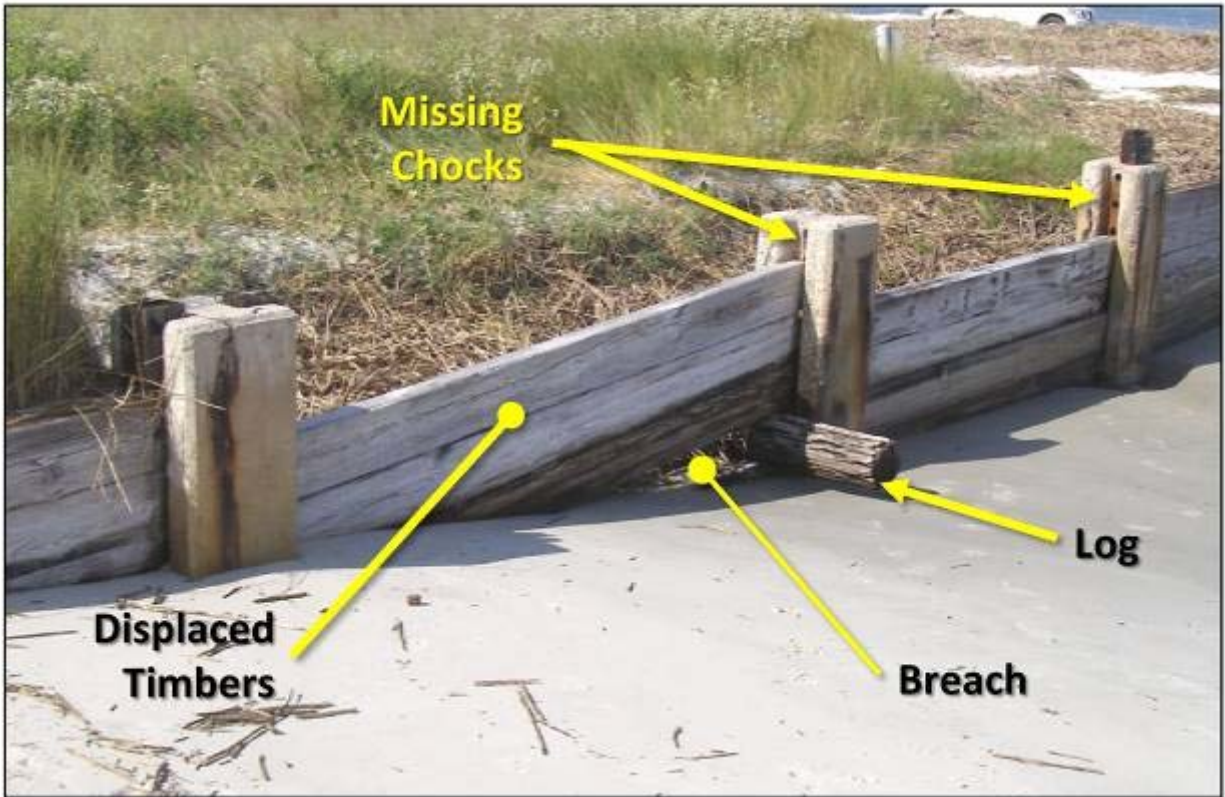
Photo (Sept. 2006) showing damaged pile/timber/chock structures and resulting breach.
